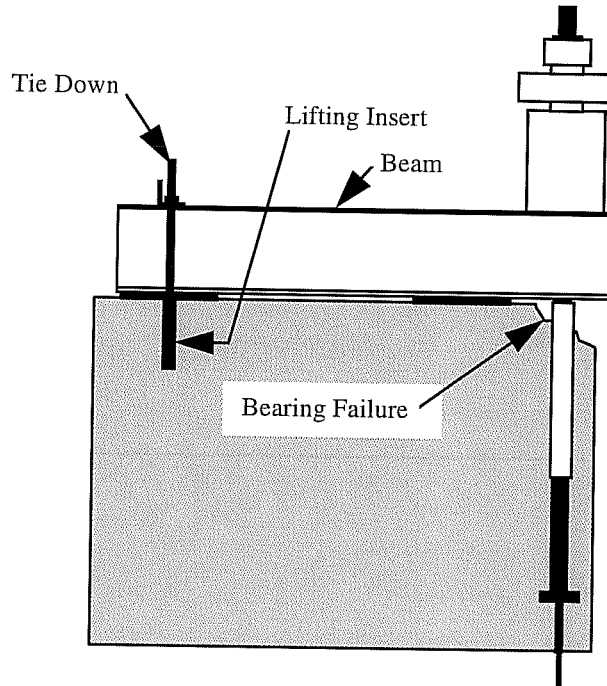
Setup for Retesting after Bearing Failure
